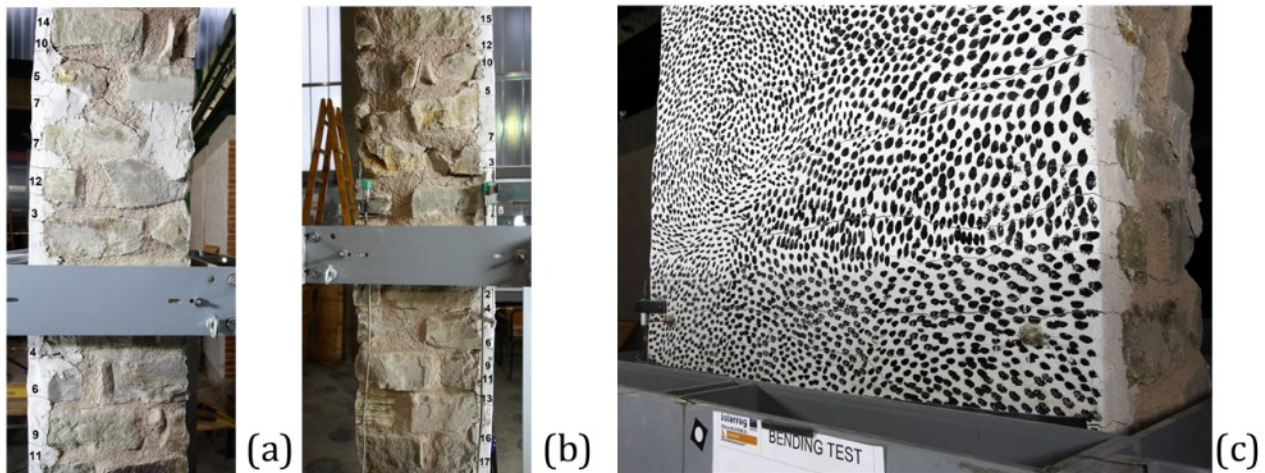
Cracks due to punching shear at $u = 35.0$ mm, right view (a), left view (b) and front view (c)
